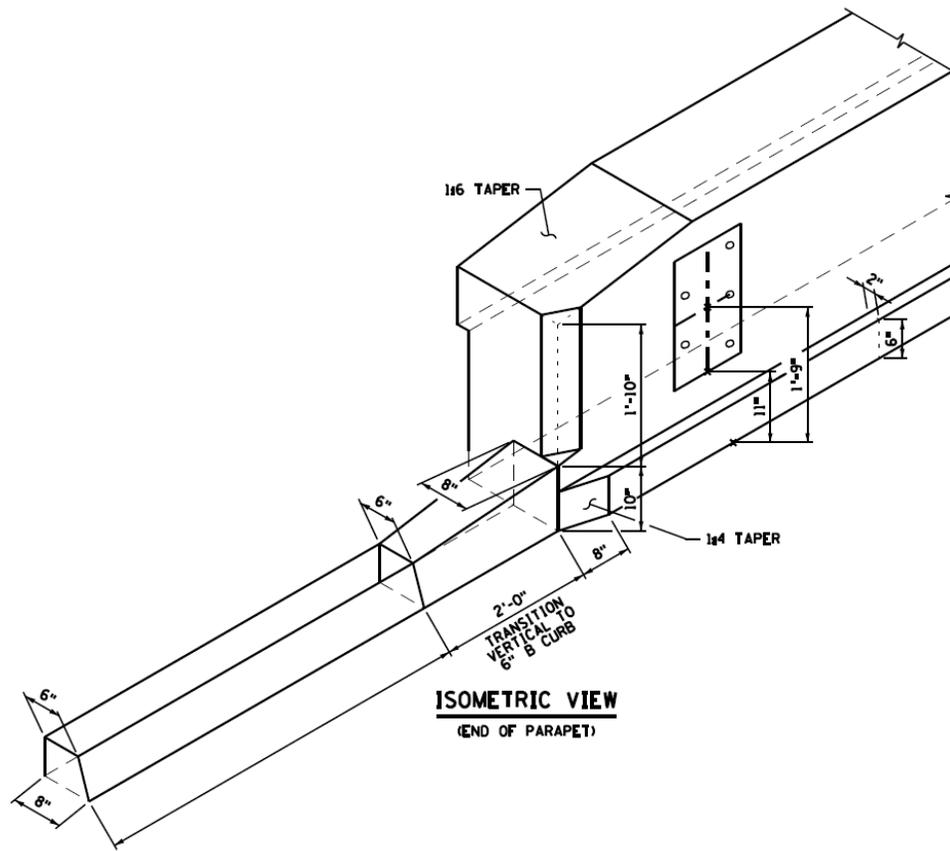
End Post and Guardrail Connection for Vertical Face Parapets
